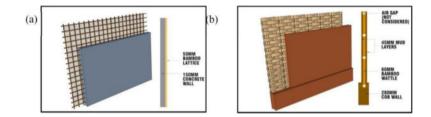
(A) BAMBOOCRETE WALL; (B) WATTLE & DAUBWALL.
